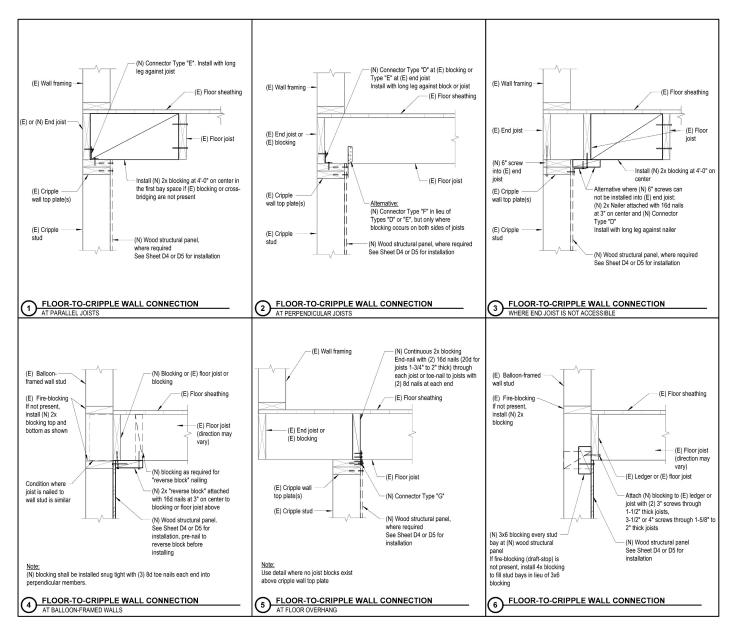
Floor framing to cripple wall connection details. Sheet D3.
